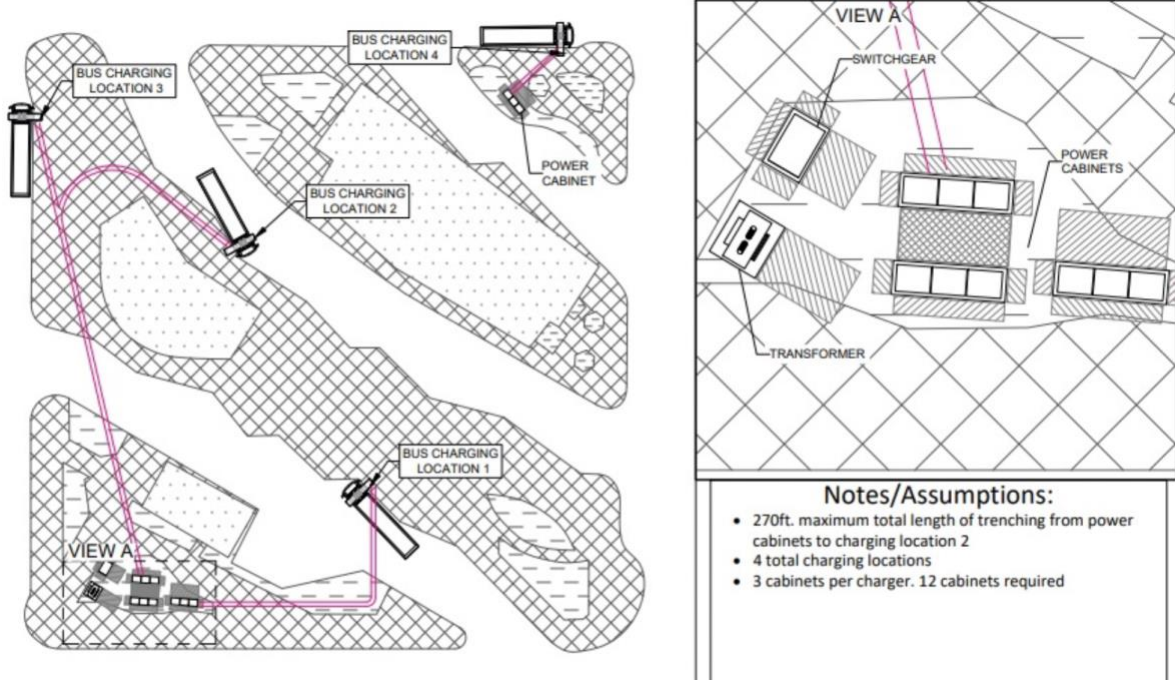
Installation Schematic for On-Route Charging at Olympia Transit Center
